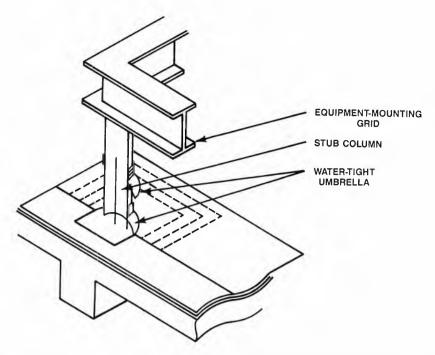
An equipment-mounting grid allows future flexibility of roof-mounted equipment, without requiring future puncturing of the roof membrane, which can lead to water damage.
